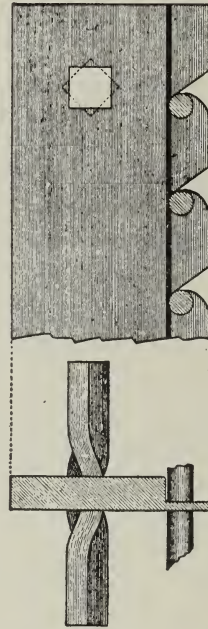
Detail of Patented Spiral Wire for Column Reinforcement.
